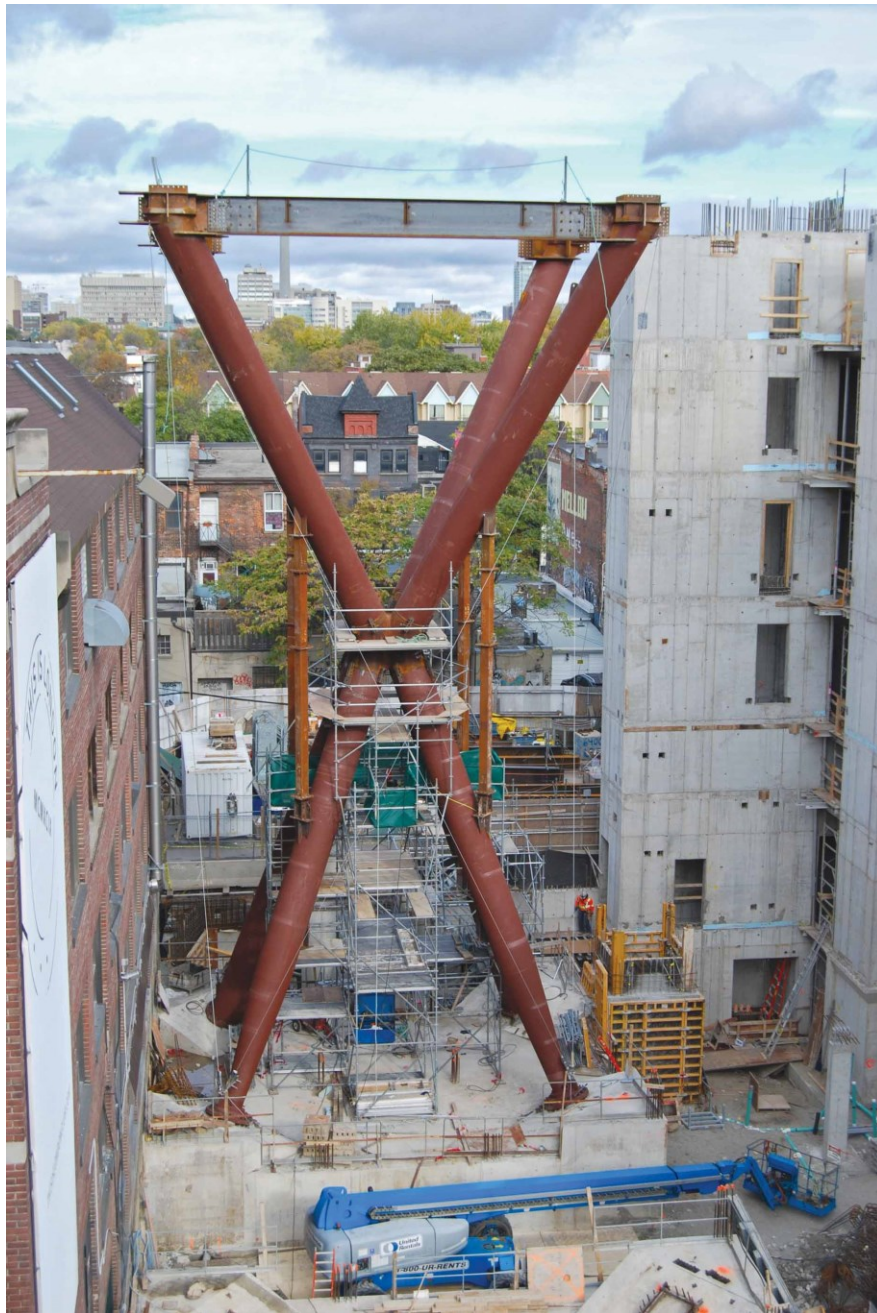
Concrete-filled HSS member, Queen Elizabeth Centre West (Courtesy of CastConnex)
